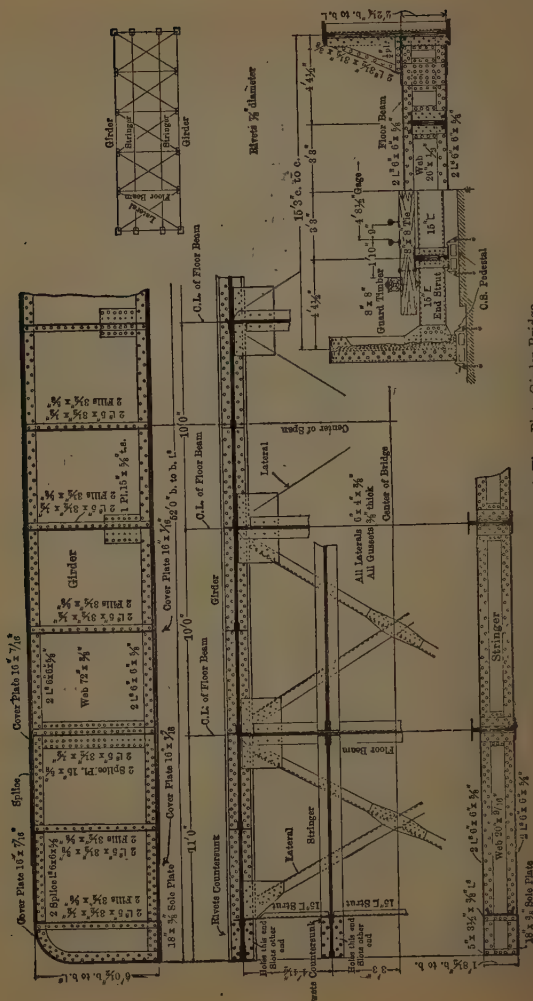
Design of a Single Track Thru Plate Girder Bridge
